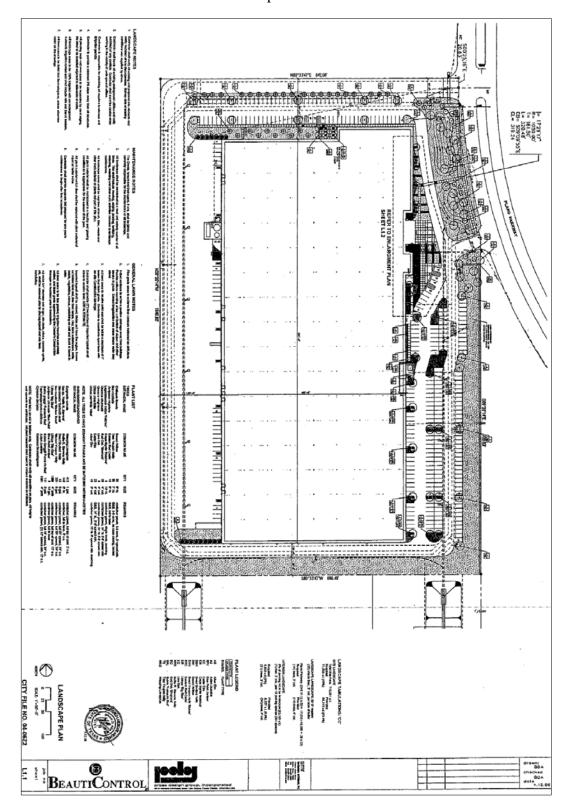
# EXHIBIT CSheet 10 of 10 Conceptual Landscape Plan
